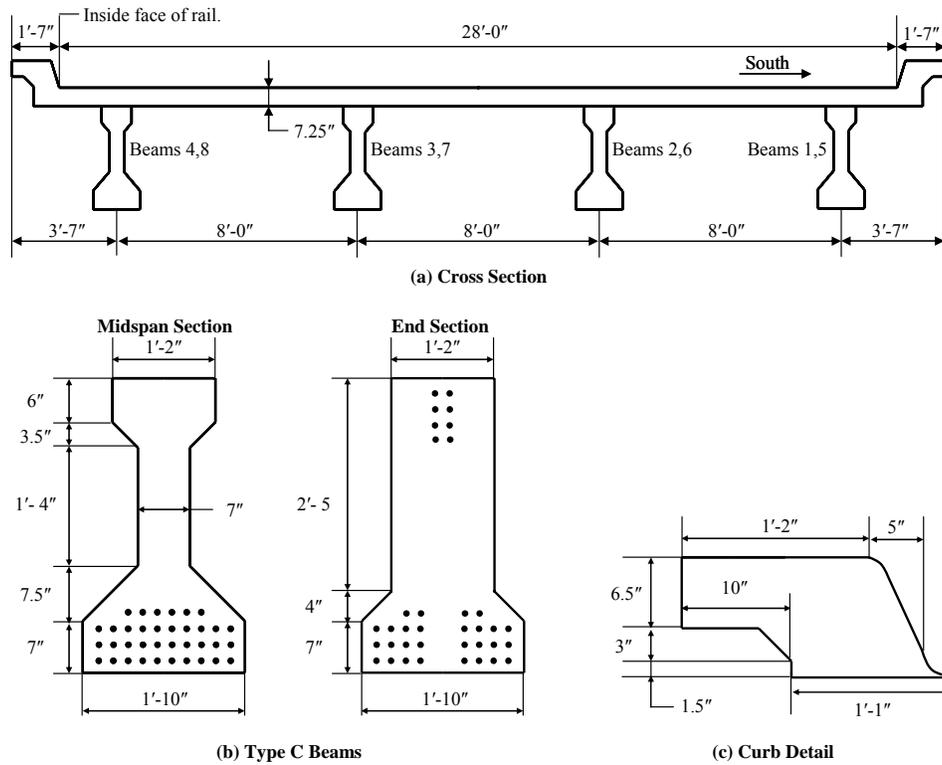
Cross Section, Beam, and Curb Details for Lake LBJ Bridge
